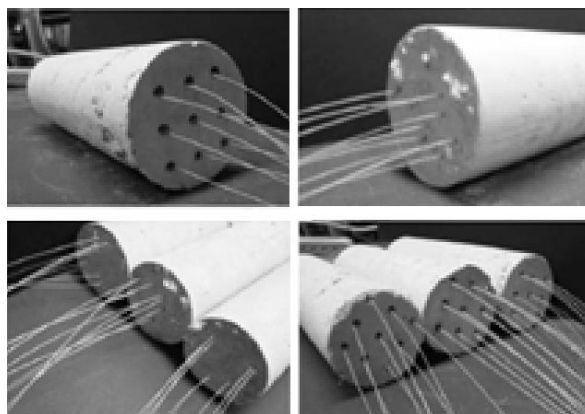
Concrete elements with embedded arrays of optical fibres that serve as binary-type indicators of structural damage (cracks) in these elements.
